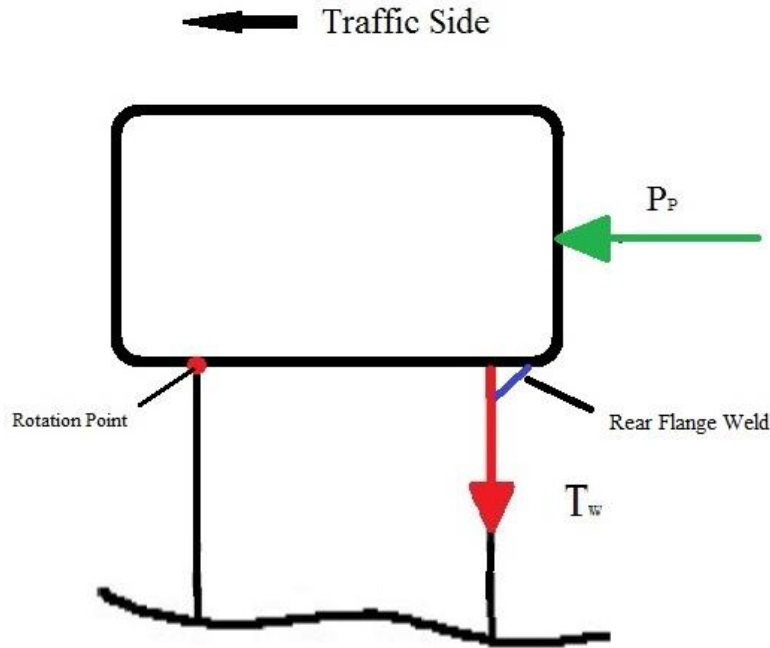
Rail-Post Rear-Flange Weld Tension
